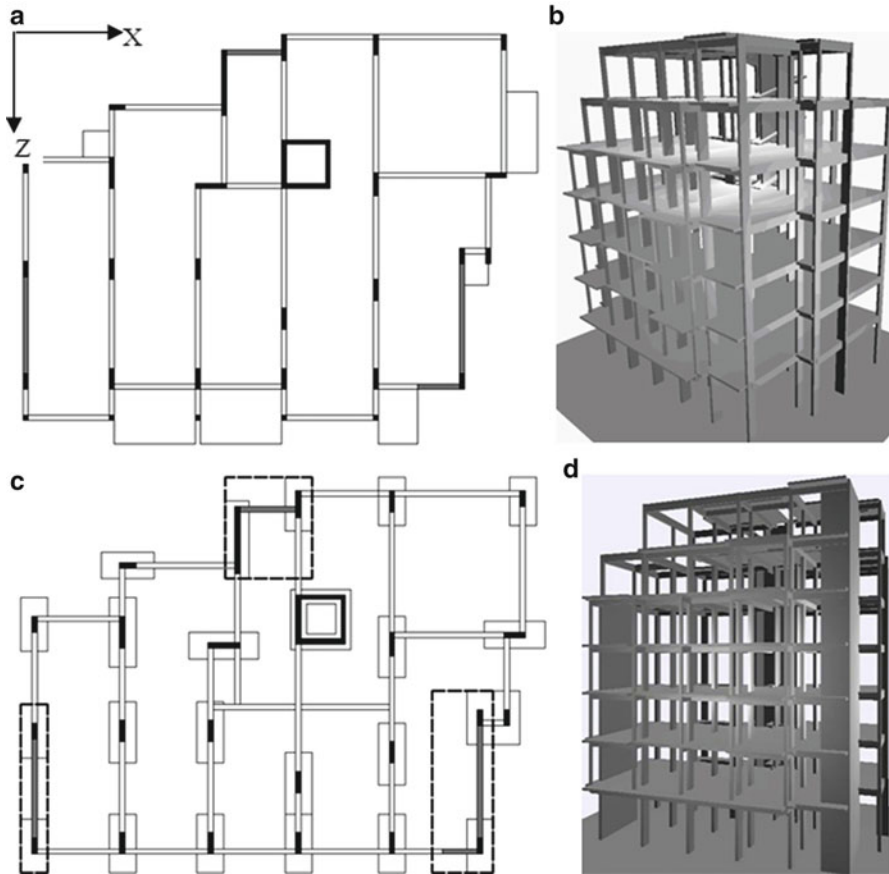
Seven-storey building: (a) plan of storeys 2–5 with the three walls added at the perimeter shown hatched; (b) axonometric, as-built; (c) plan of foundation with walls added shown hatched and new footings with a *dashed outline*; (d) axonometric, with three added walls
